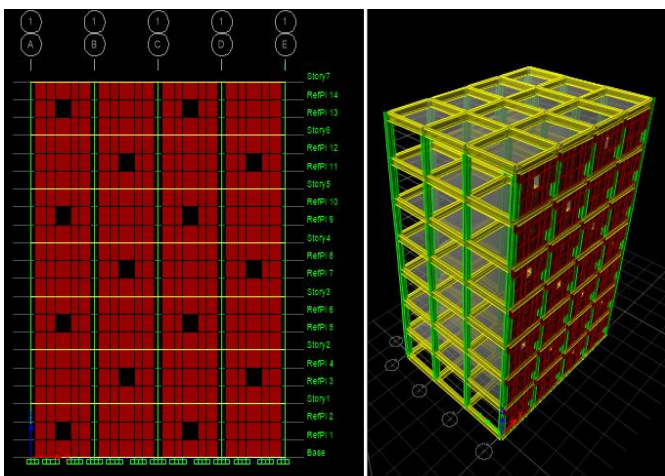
Modeling of structure with shear wall having openings arranged in zigzag manner
